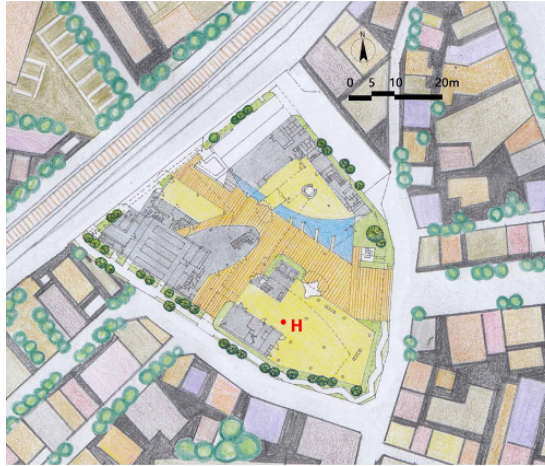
The entrance hall (H) in the south building. (Source from: drawing and photo from the author)
